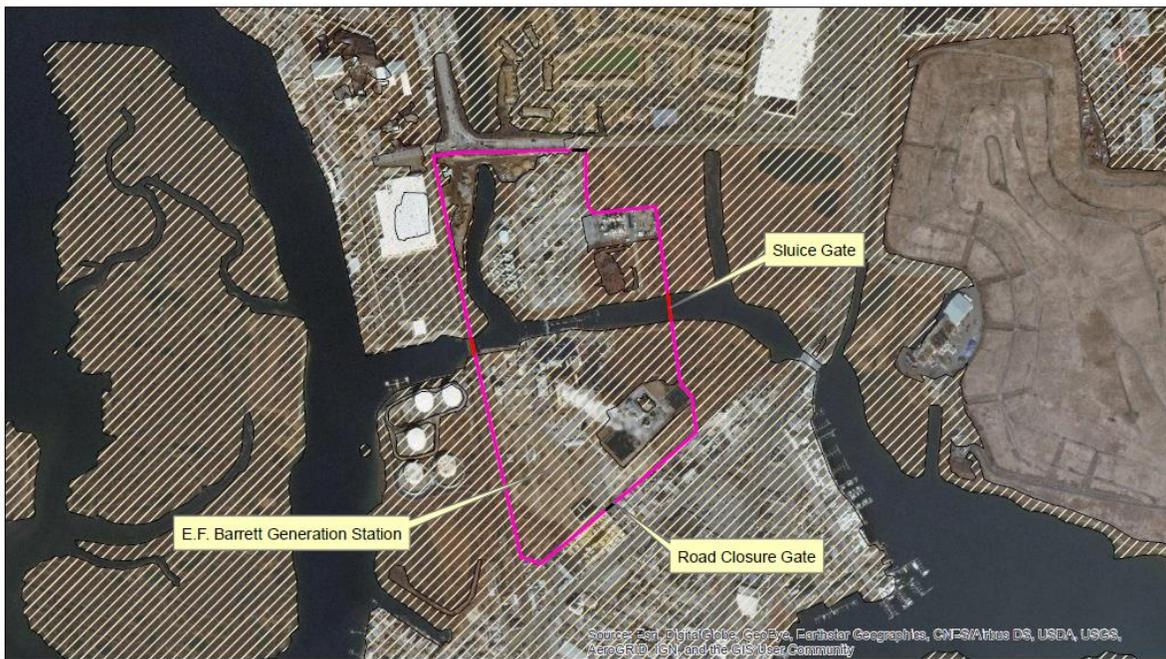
Island Park Critical Infrastructure Plan (Courtesy of USACE-NAP)
